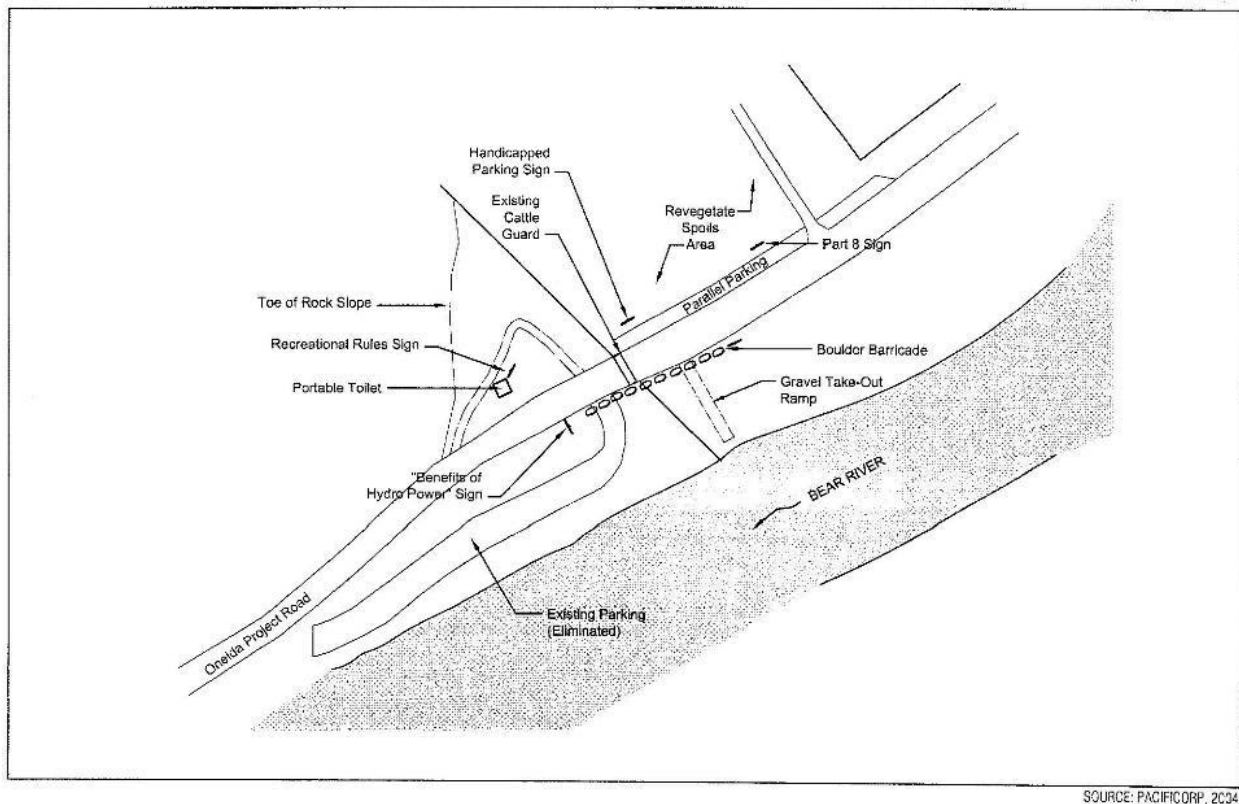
Site plan of the Oneida Narrows Take-Out.
